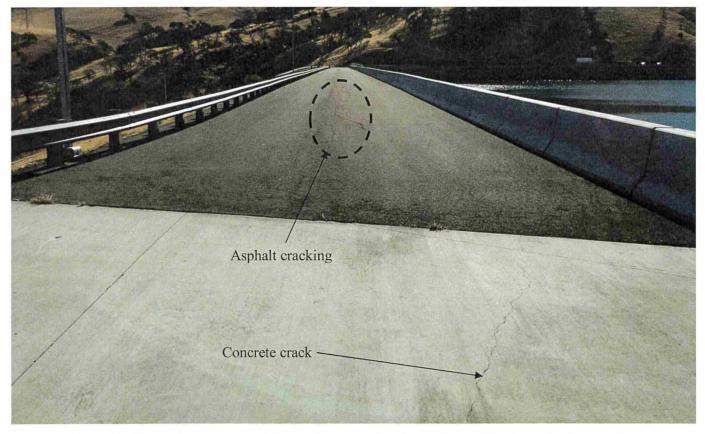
View of concrete crack in the foreground and asphalt cracking in the background.
